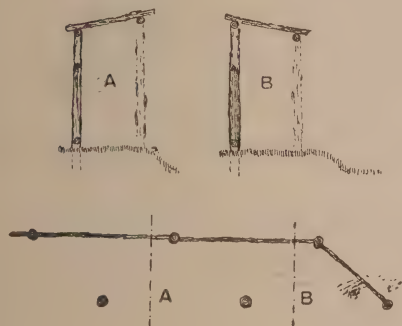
Two Elevations of Frames and Plan of Promenade Pergola
